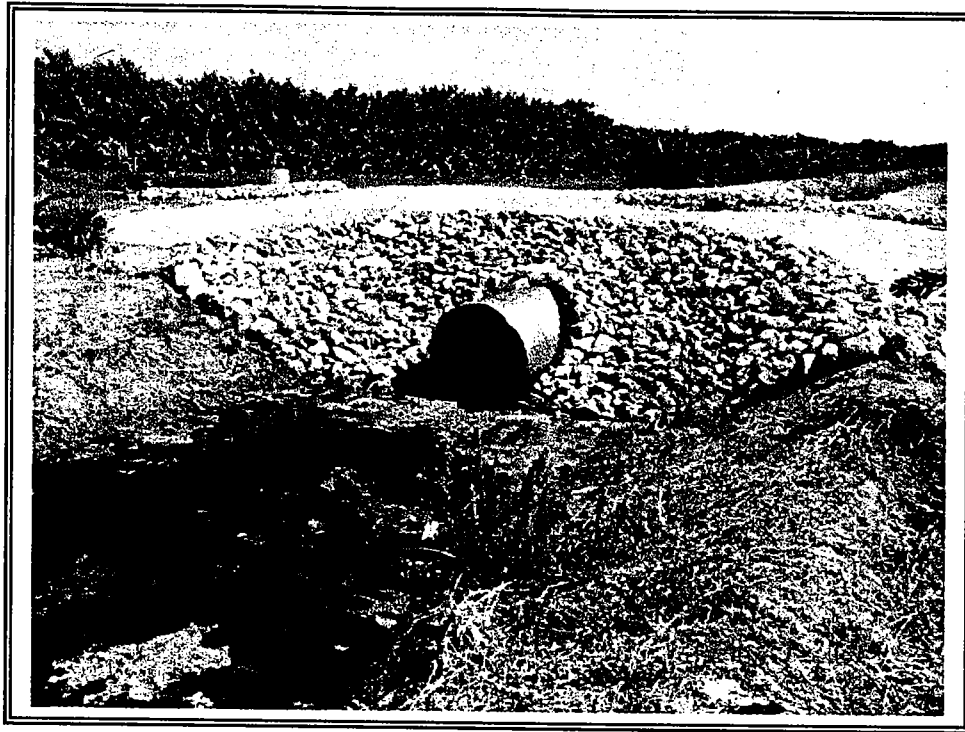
Photograph of corrugated metal pipe and armor wall supporting the internal farm road.
